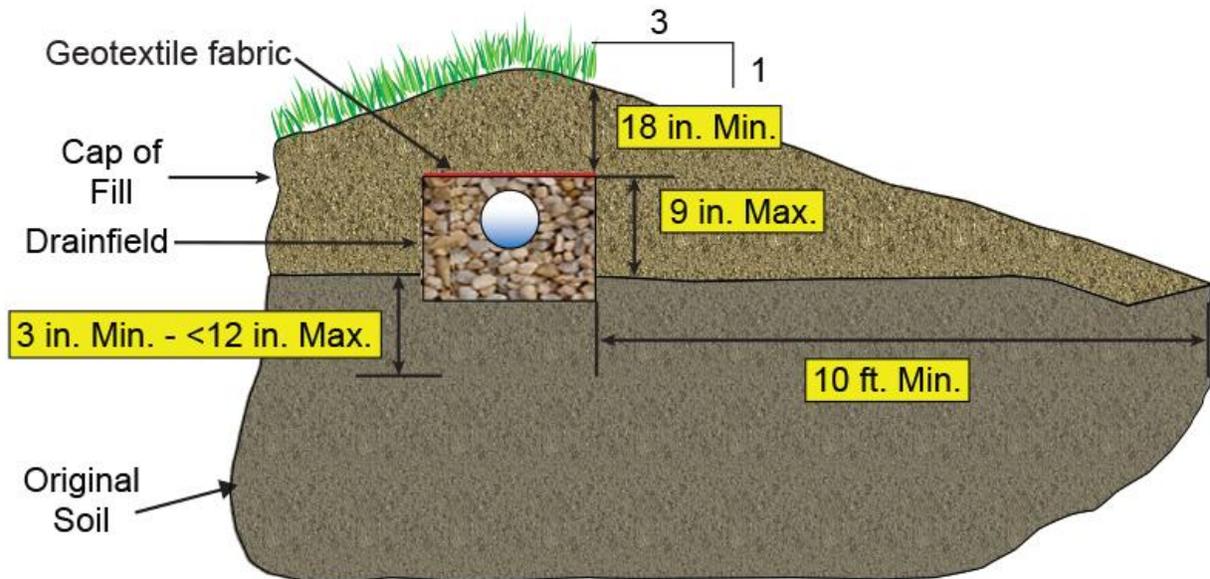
Cross-sectional view of an above-grade capping fill trench.
